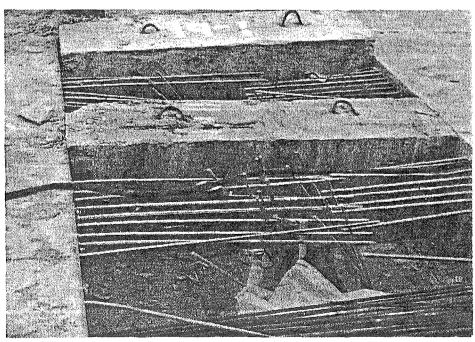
Crushing of spreader beam at top slab expansion joint.
